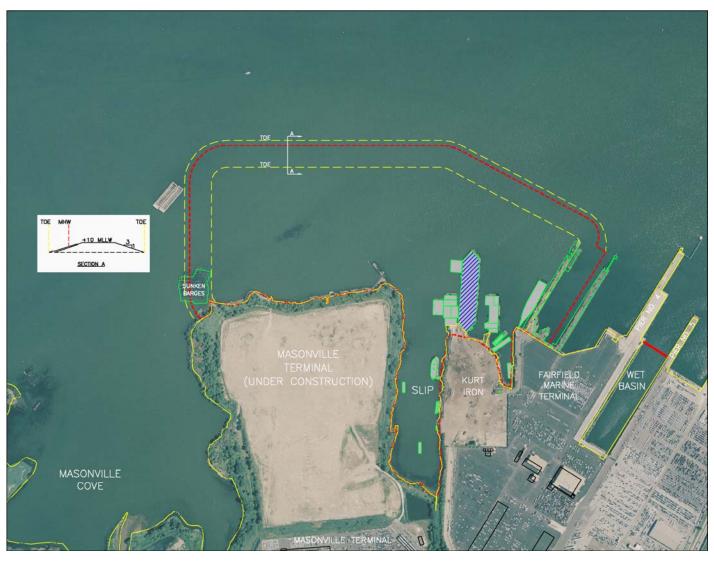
Location and Dimensions of Alignment 6 Proposed for the Masonville Dredged Material Containment Facility
